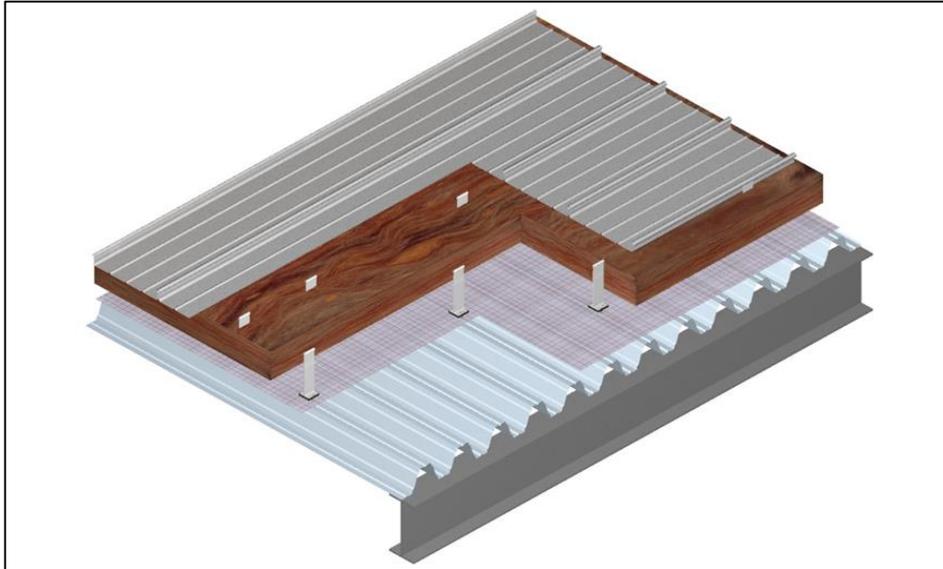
Standing seam system in a double skin deck/rafter roof application (Kalzip)
